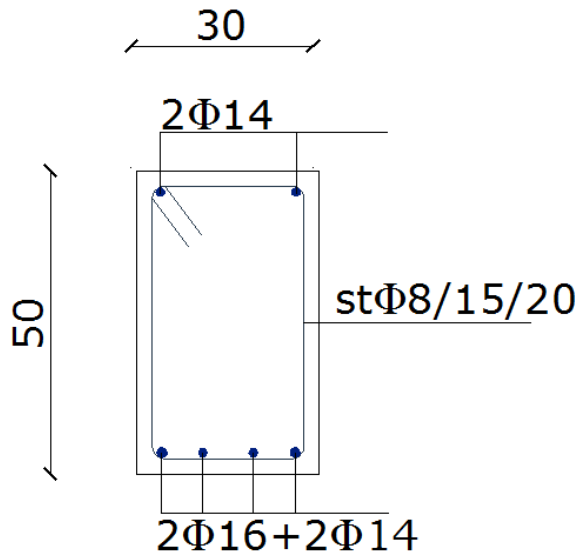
Beam reinforcement for Case 1 (span) Figure 4.8: Beam reinforcement for Case 1 (support)
